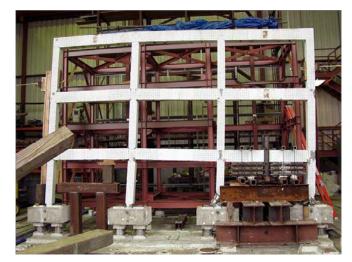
Shaking table test to validate models for simulating collapse of nonductile concrete frame. Right-hand portion collapsed onto restraining frame.
